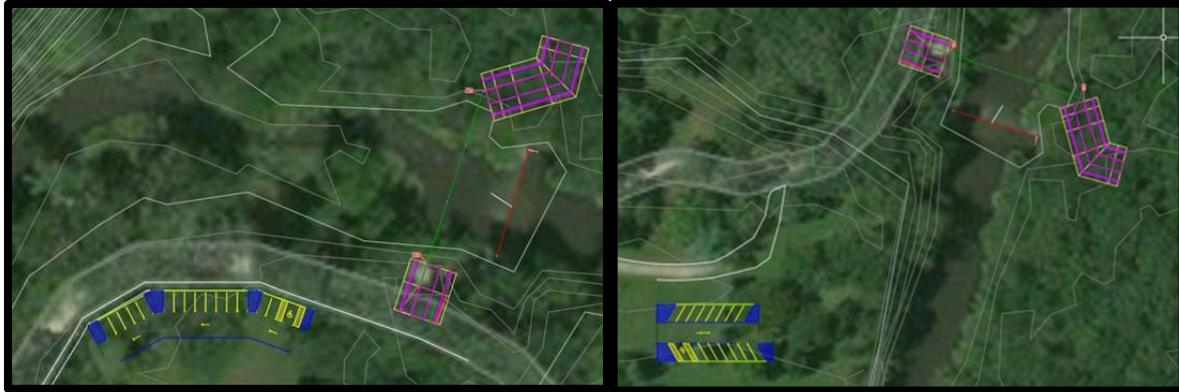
Parking lot alongside the road across spillway and bridge location (Left) and the parking lot location south of the spillway (Right)
